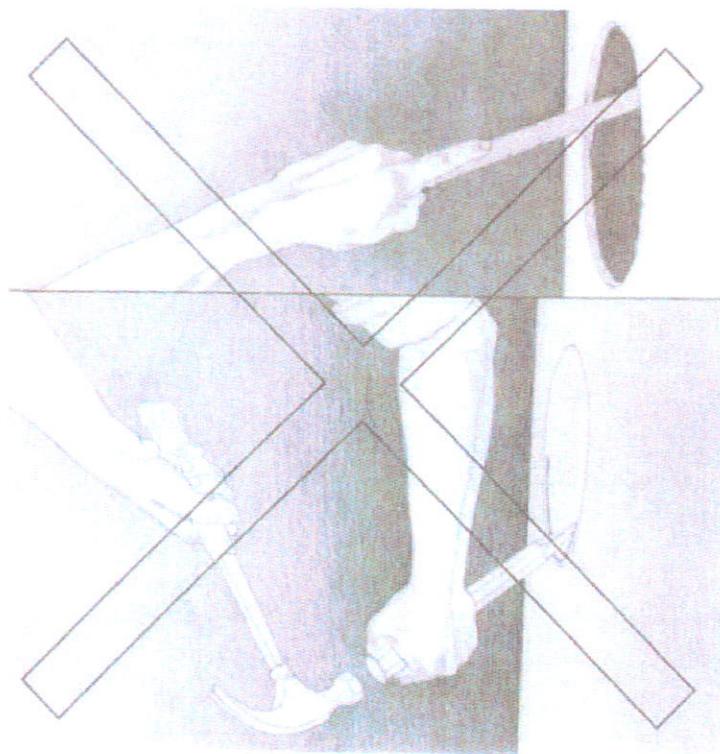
B Electrical drills, chisels, and rasps should not be used to make held connections in asbestos-cement pipe
